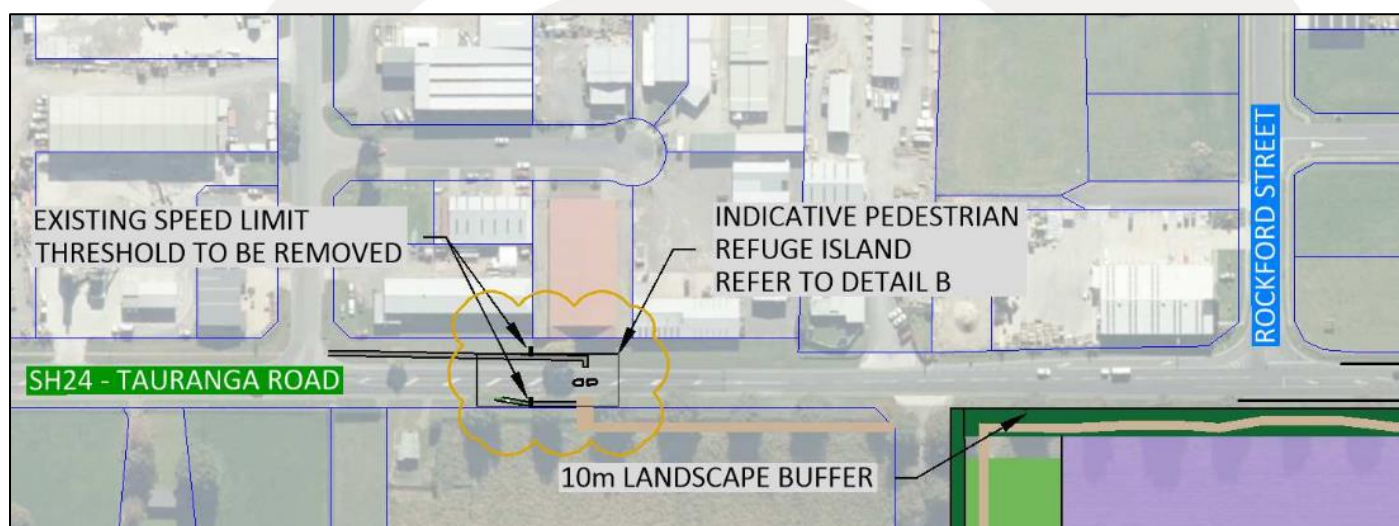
Pedestrian facilities along SH24 (extract from SH24 Roundabout Access Overall Plan, 146930-02-0221 Rev B)
